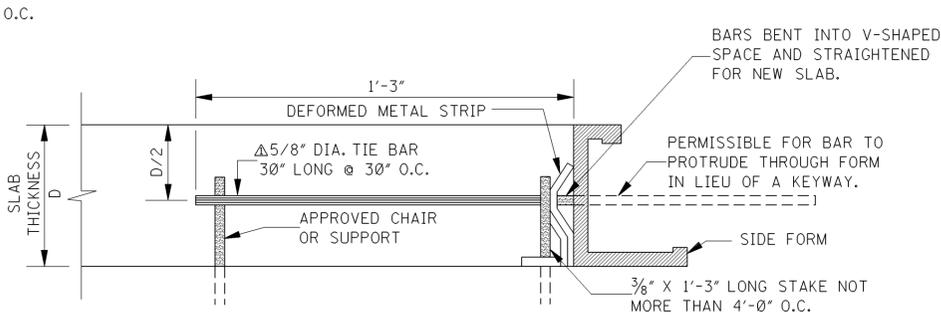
DETAILS OF LONGITUDINAL JOINTS FOR CONTINUOUSLY REINFORCED CONCRETE PAVEMENT
